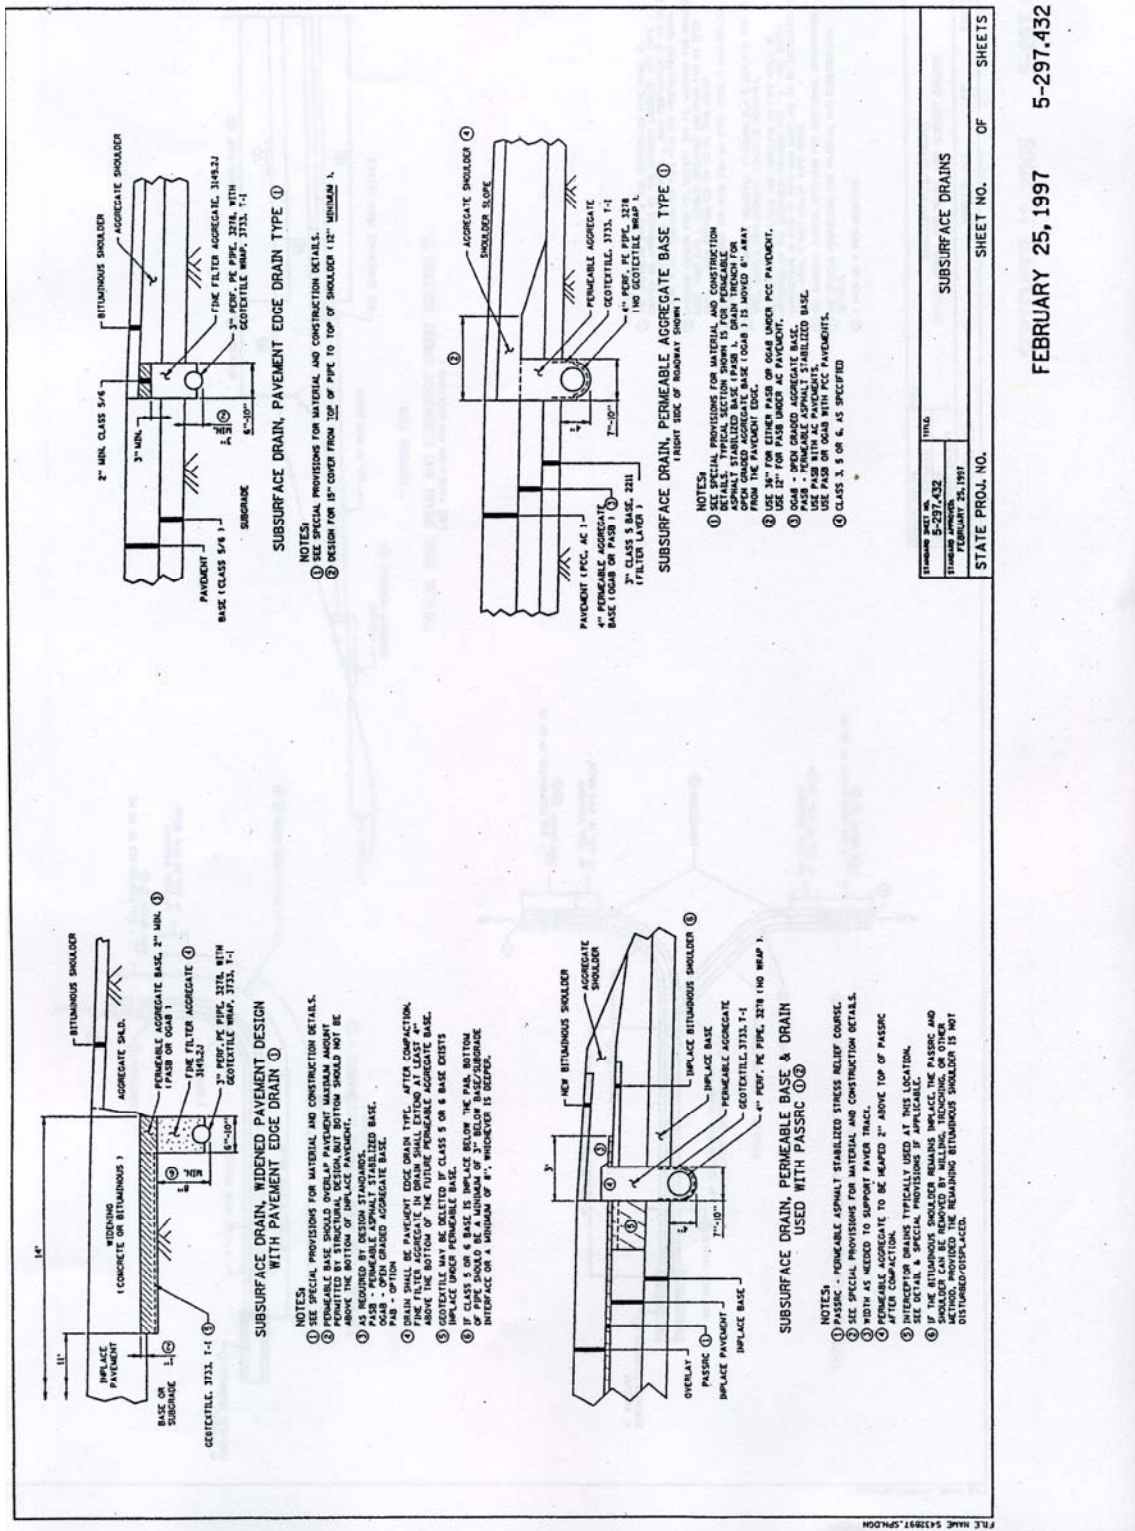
Subsurface drainage systems: pavement edgedrain, pavement edgedrain Type I, permeable base, and permeable aggregate base type I (Mn/DOT, 1994b).
